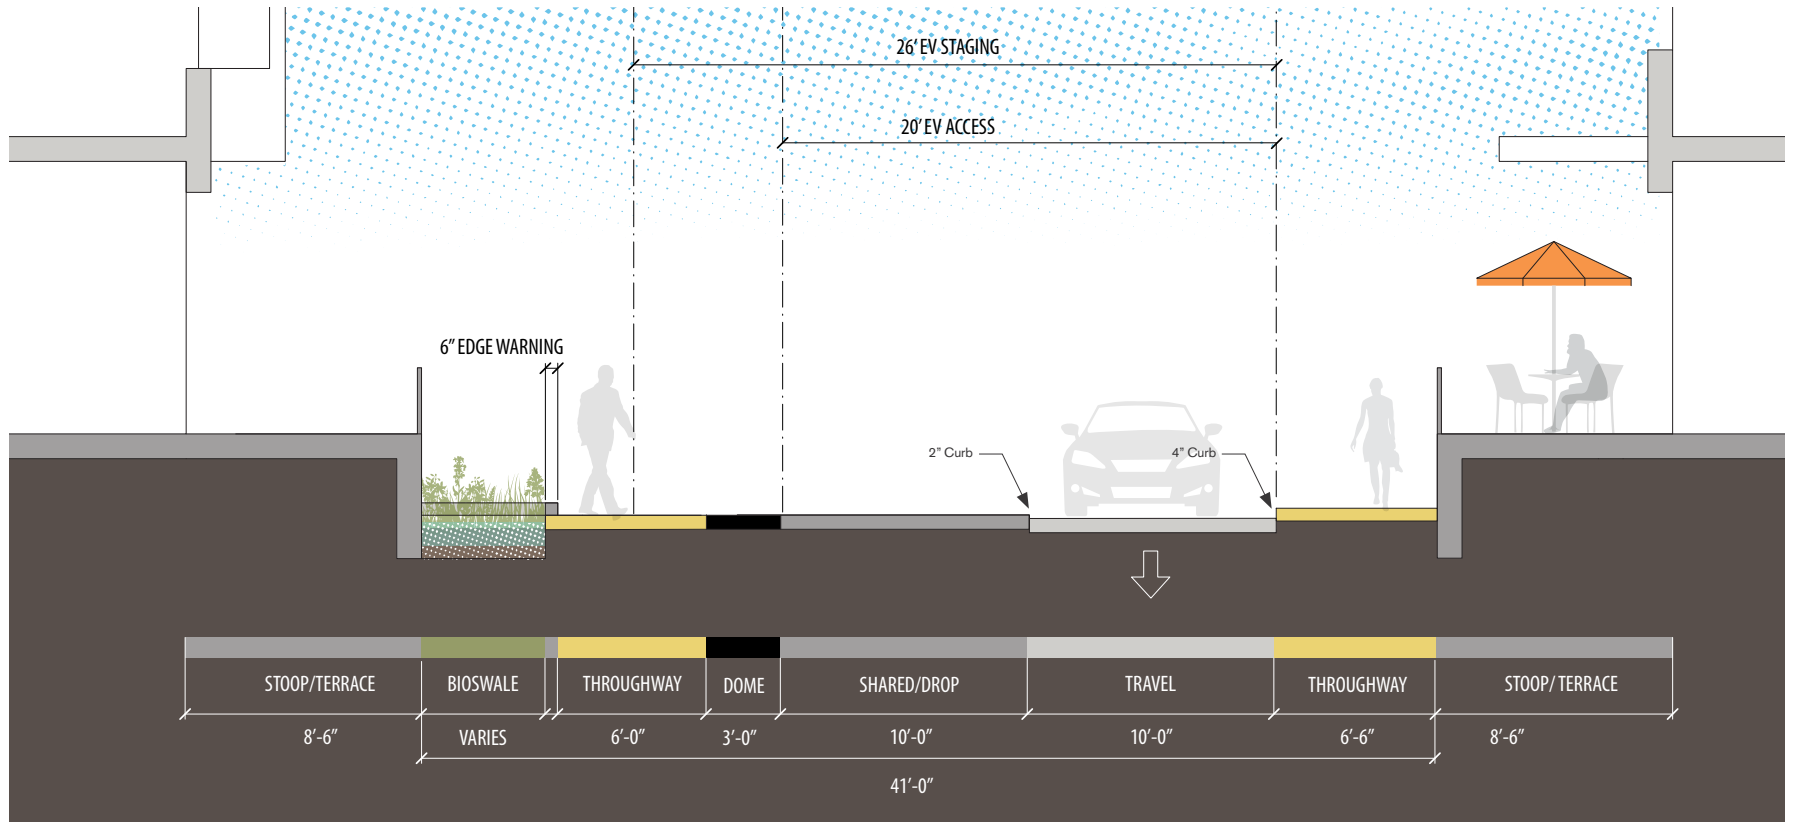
TYPICAL SHARED PUBLIC WAY SECTION
